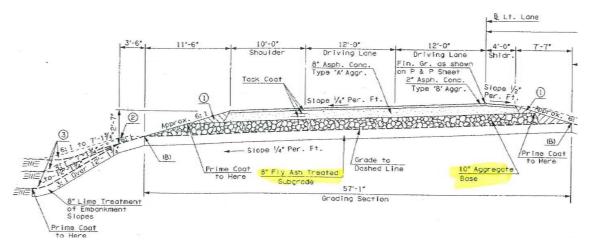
Typical cross section US 59 Le Flore County, Oklahoma
